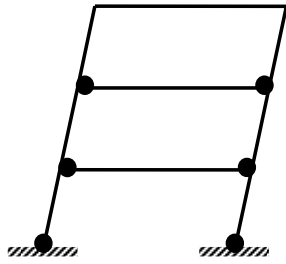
Strong column/weak beam configuration      Figure 2. Soft first story failure
